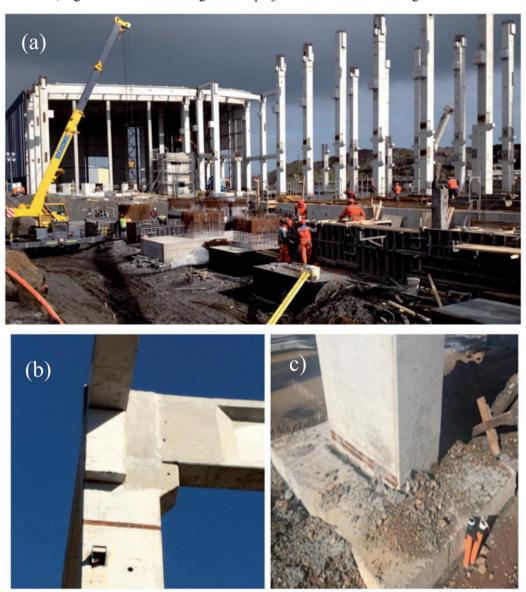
(a) Construction and assembly of structural elements, (b) Hybrid connection at top and (c) Bottom edge of a column.
